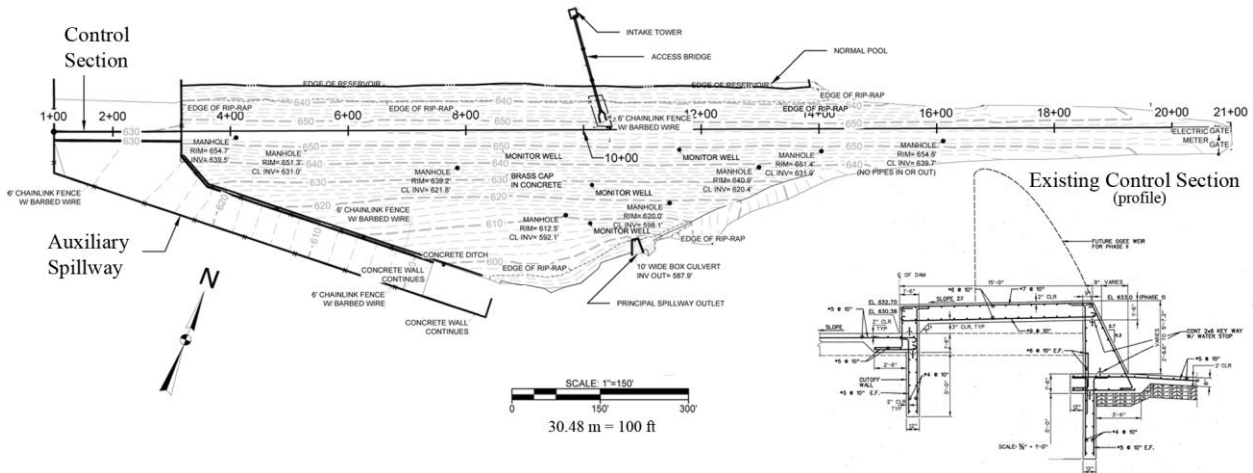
Schematic of existing auxiliary spillway for West Fork of Eno River Reservoir Dam and detail of broad crest and originally proposed ogee for raise
